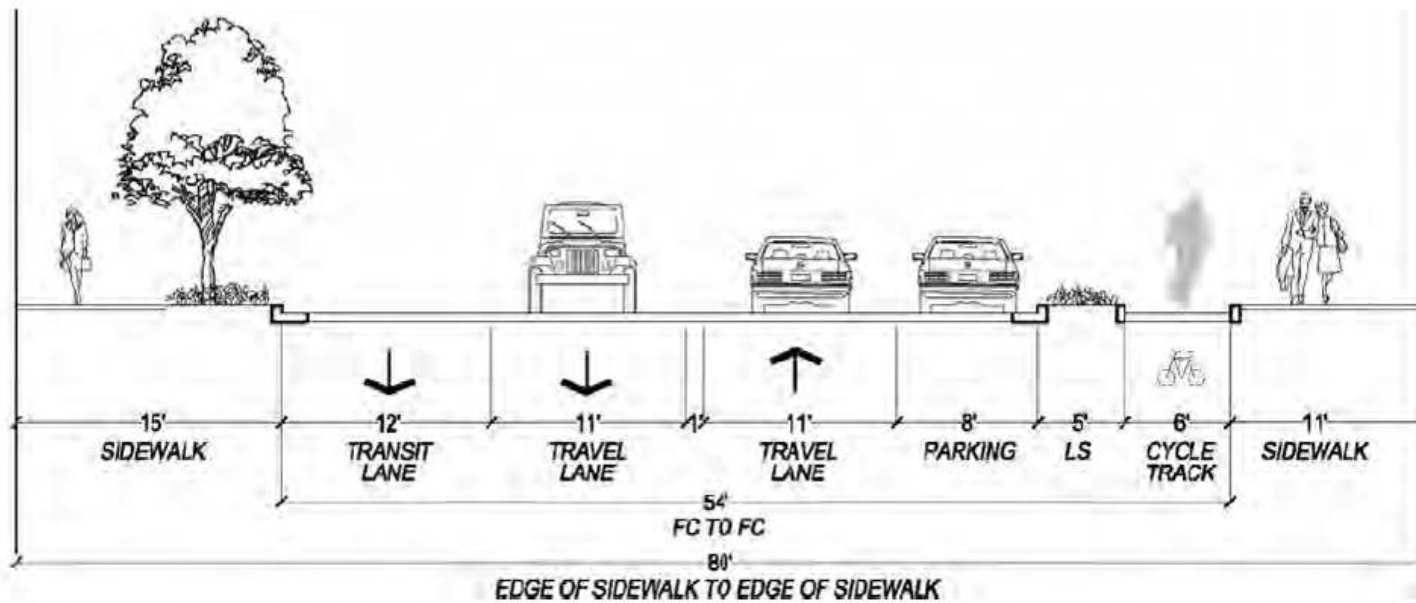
Recommended mid-block cross-section with one-way transit looking north between 12th Street S. and 26th Street S.
